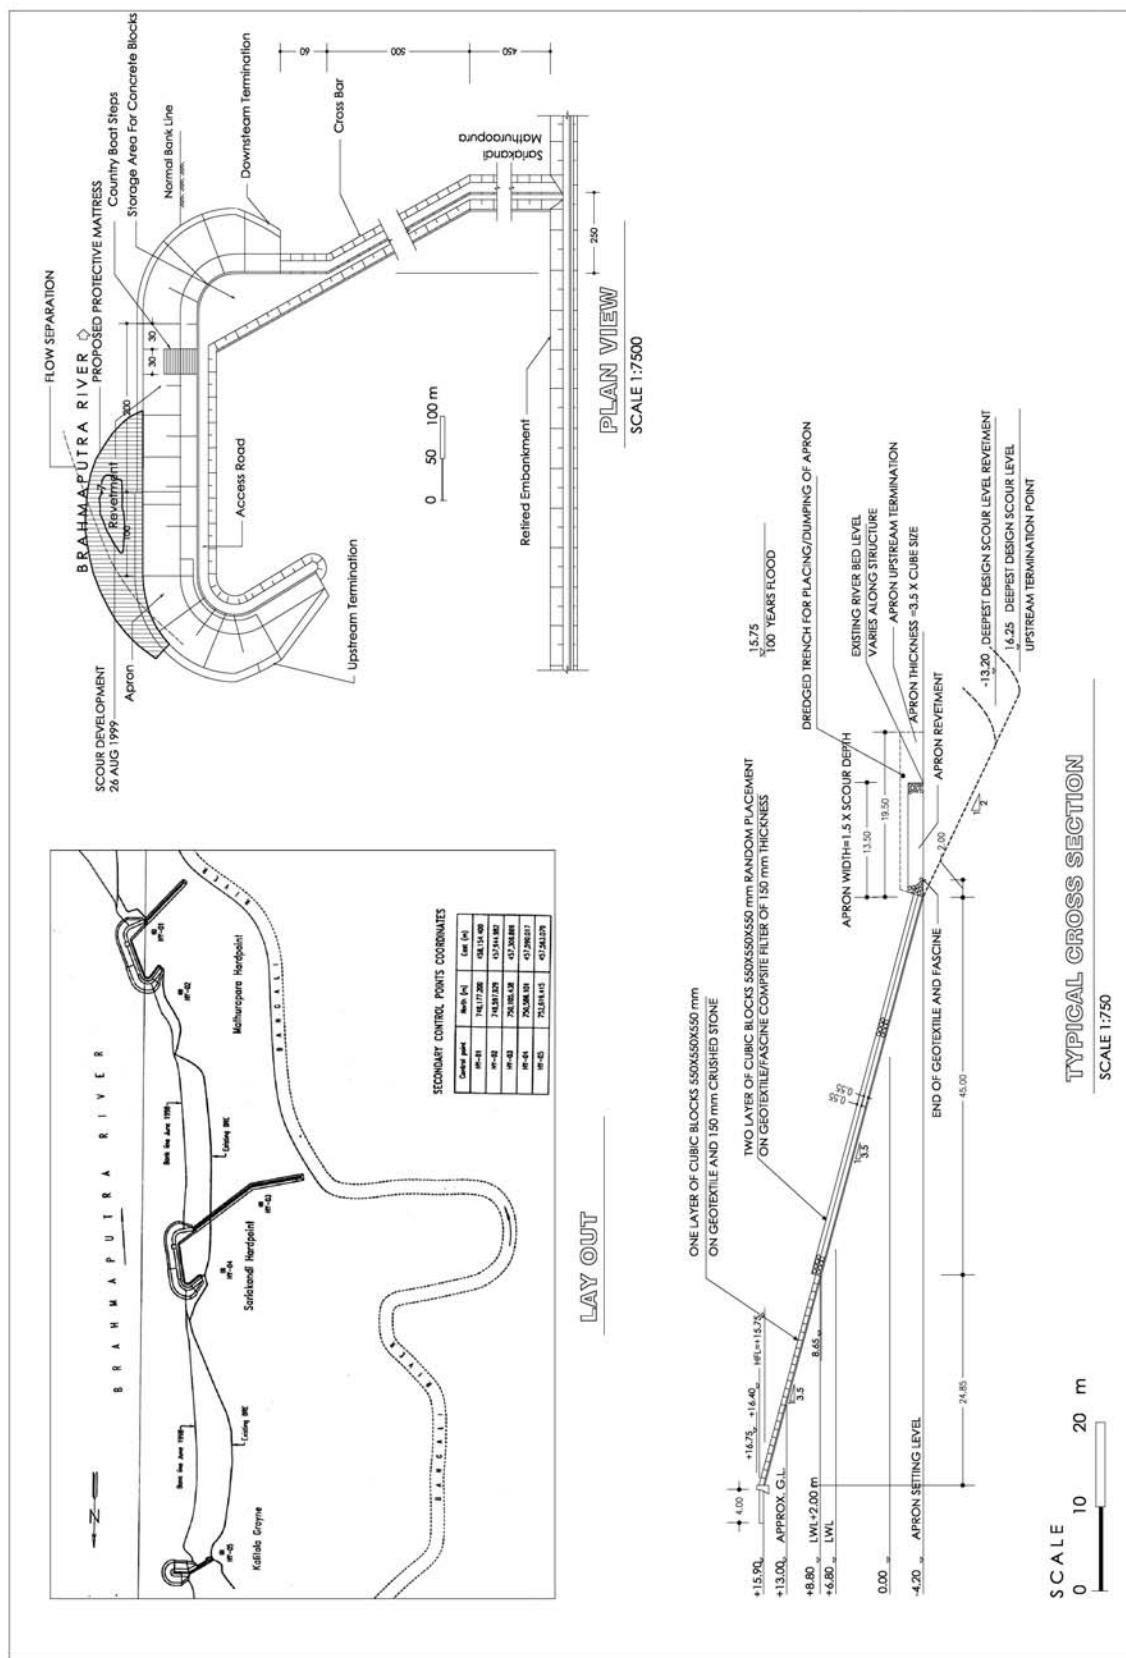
Layout and typical cross-section and layout of Sariakandi hard point.
